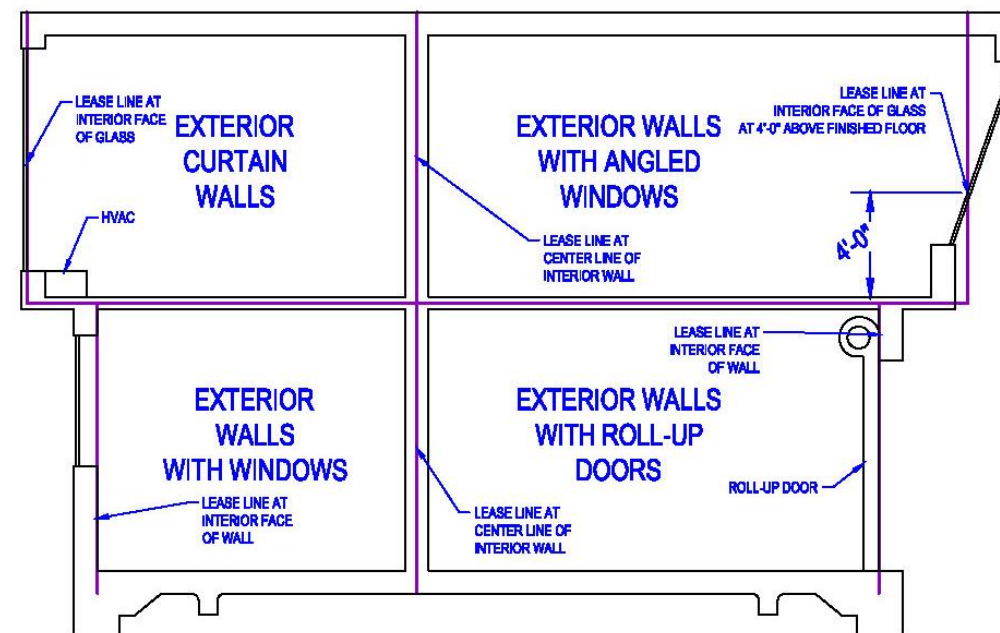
Typical Holdroom Conditions (Plan View)
